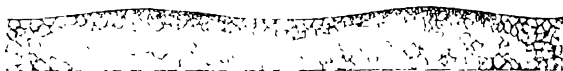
Typical Section of Wavy Waterbound Macadam Road
